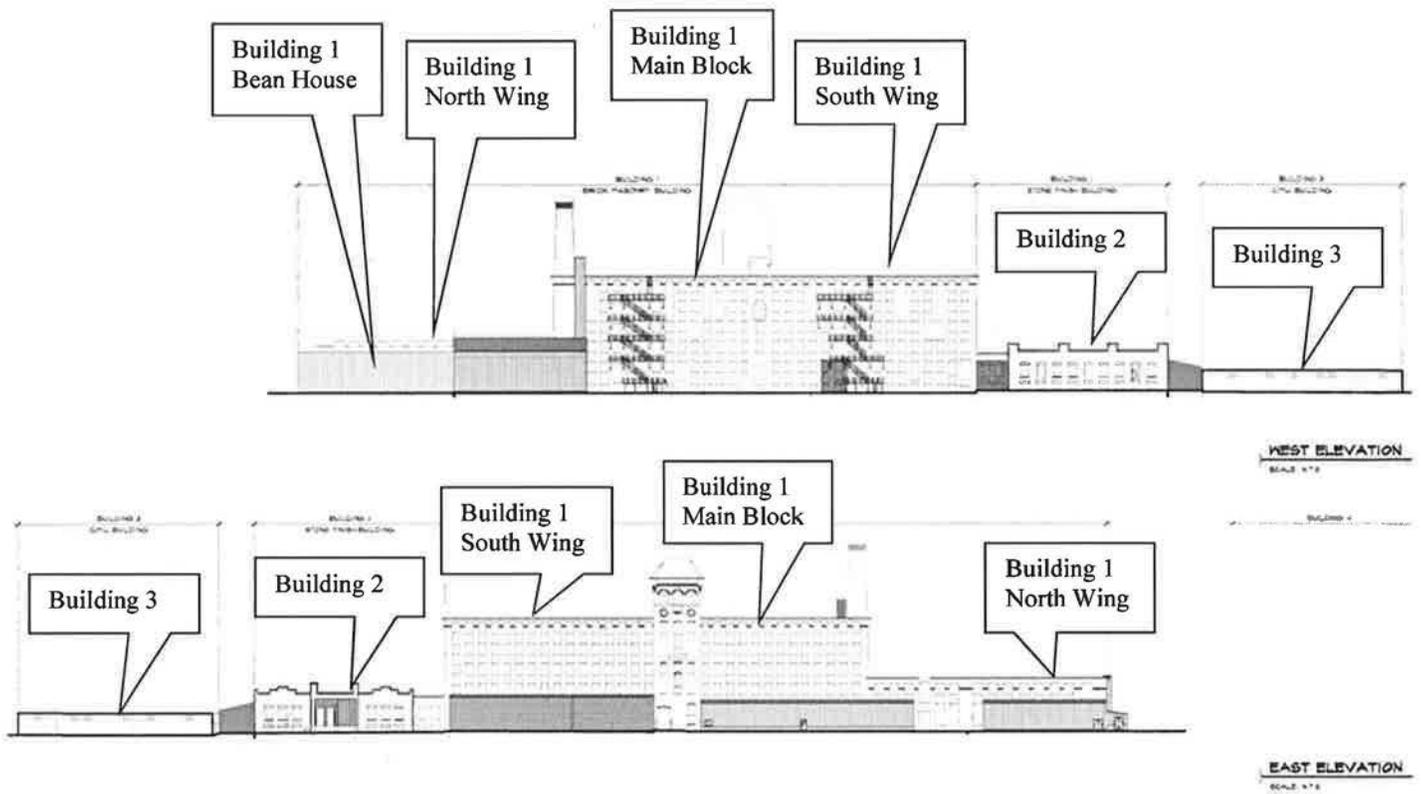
, Existing Elevations, East and West Buildings 1, 2, and 3
